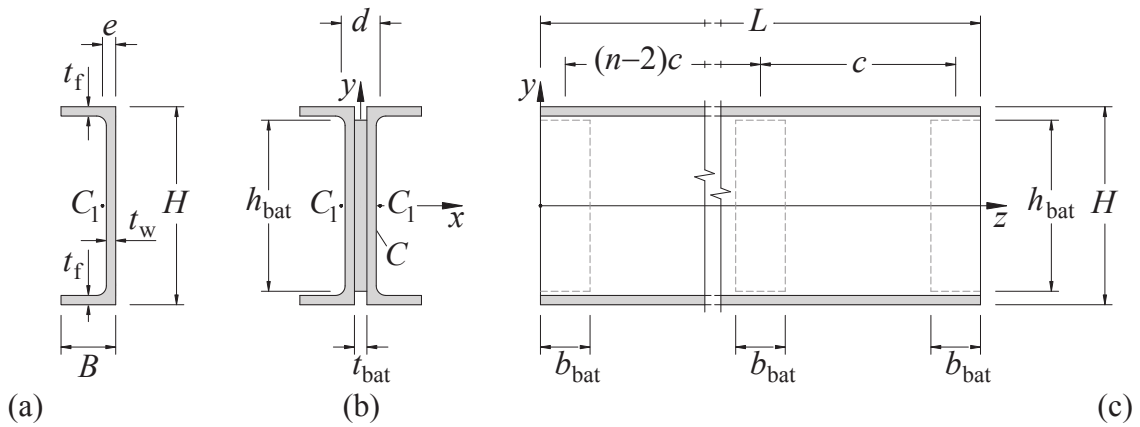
Cross-sectional view of (a) one single channel and (b) two back-to-back channels connected through a batten plate; (c) side view of a built-up member.
